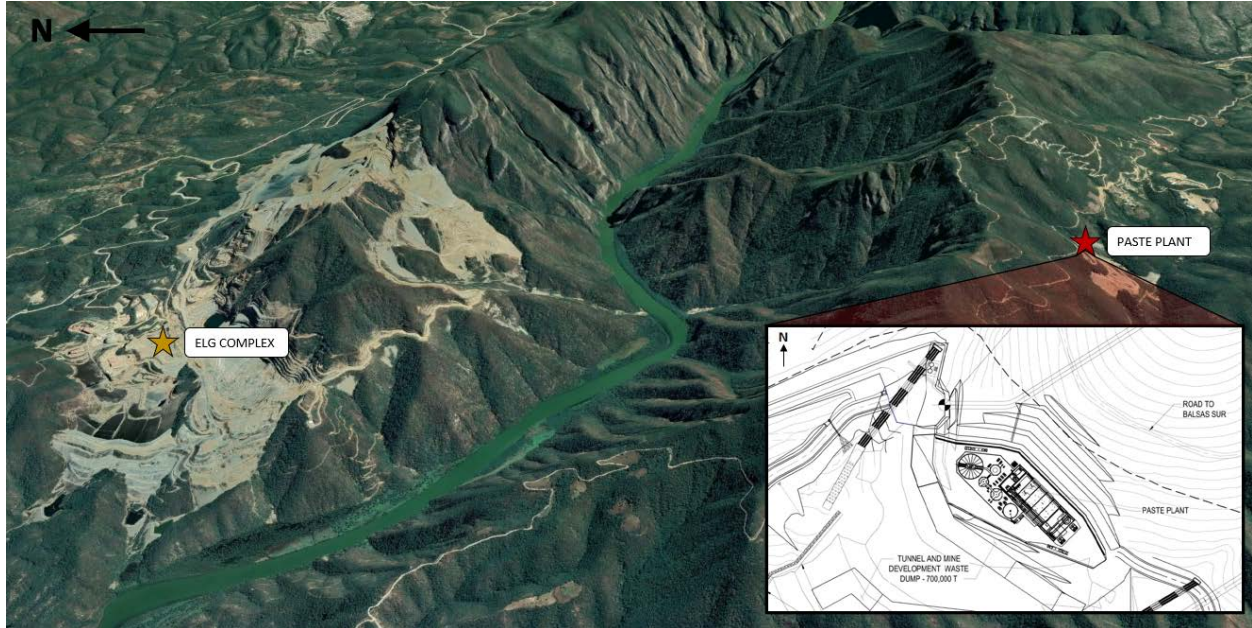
Site Layout – ELG Mine Complex and South Portal Paste Plant
